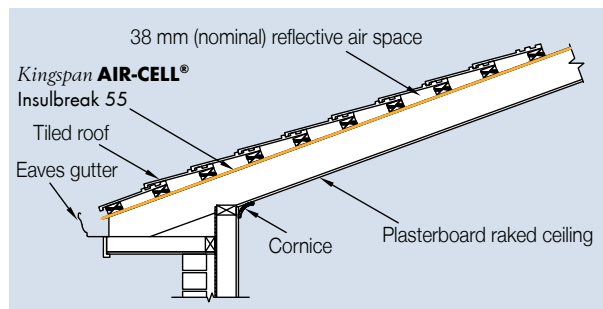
Side elevation of Kingspan AIR-CELL Insulbreak® 55 in a tiled roof with a raked ceiling
